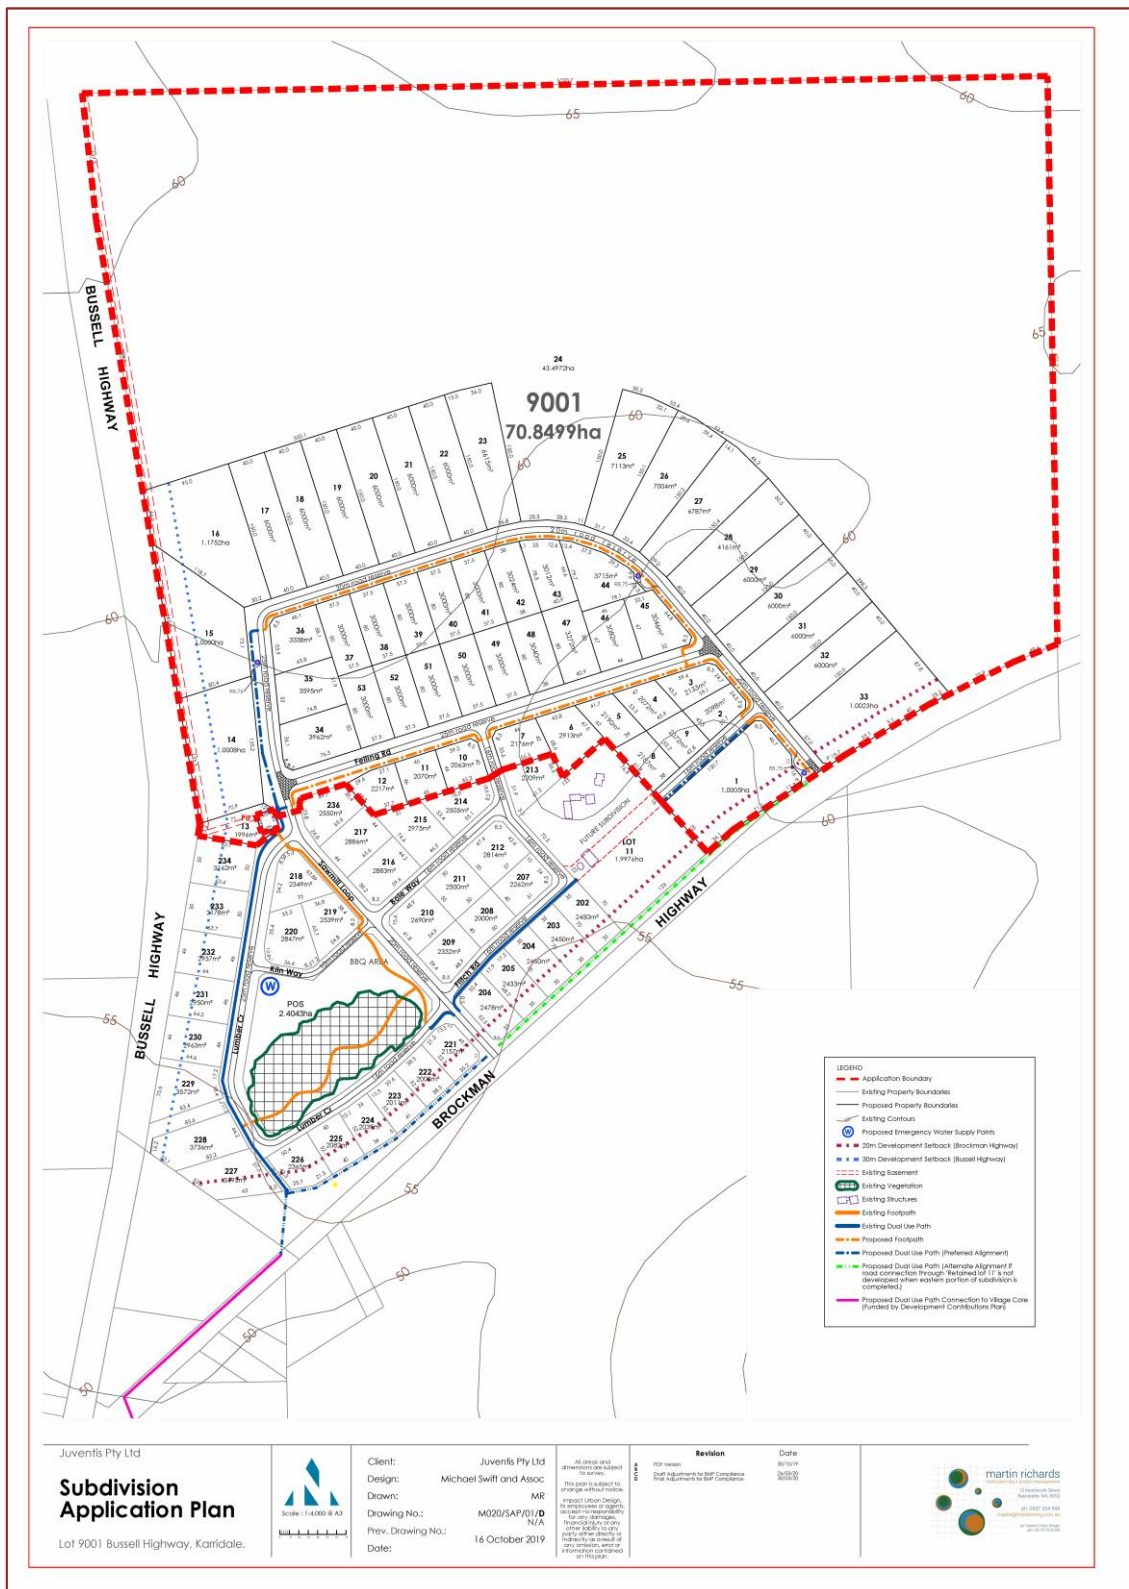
Proposed Subdivision Plan for Lot 9001 Brockman Highway, Karridale
